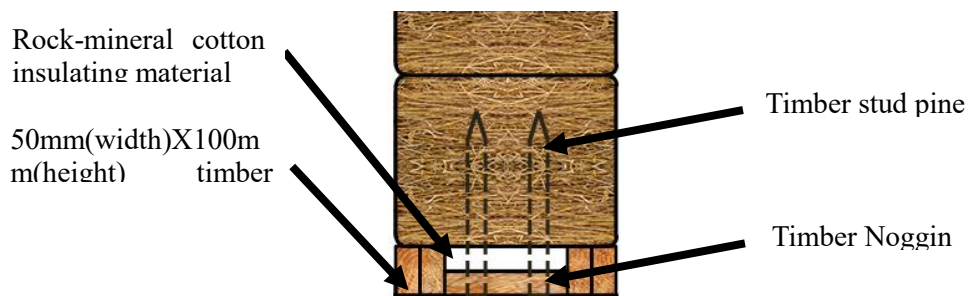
Section of developed base plate detail in the experimental straw bale house.
